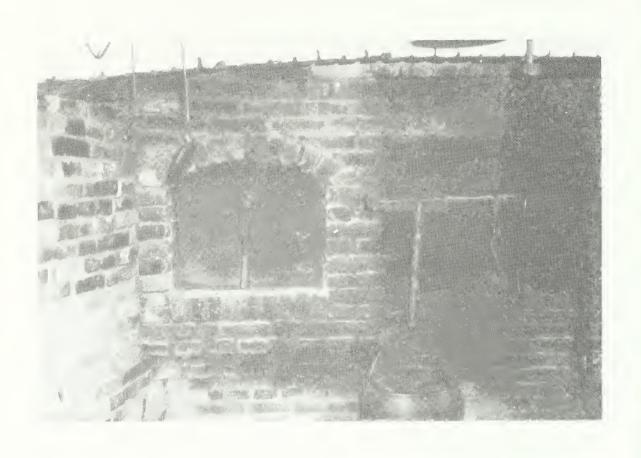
Kitchen (Room 105), east wall, bake oven in fireplace.
